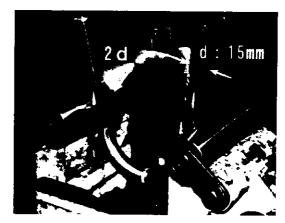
Appearance of 3-point bending test (Bending radius: 30 mm)
